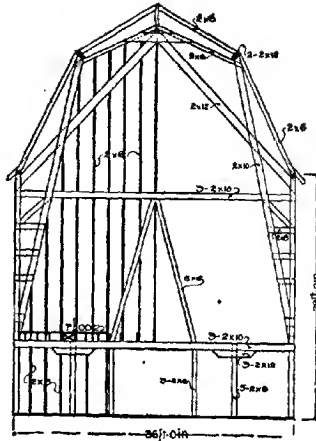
SHOWING CONSTRUCTION OF PLANK-FRAME BARN, END VIEW
